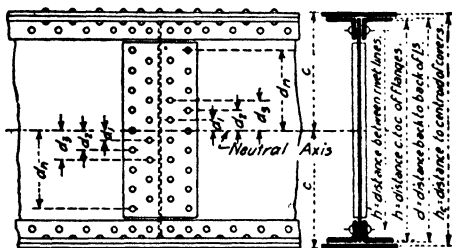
WEB SPLICE FOR PLATE GIRDER.
